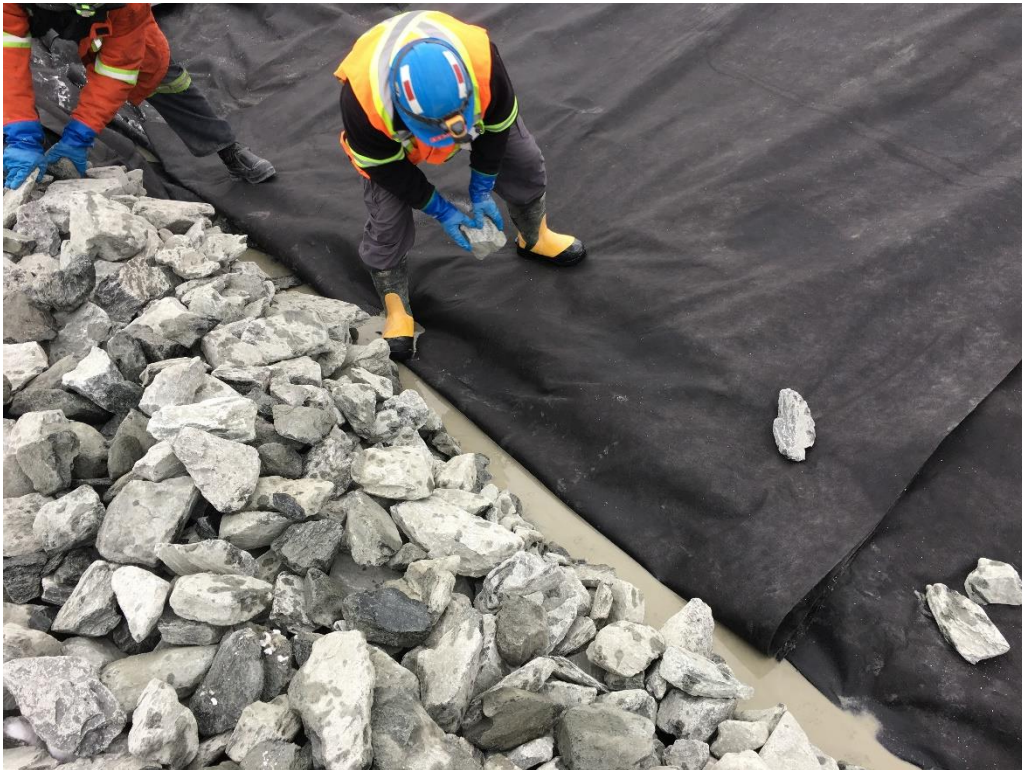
On going process of patching the damaged geotextile. The sheet has been folded on over a 1m to ensure proper overlap of the damaged area.
